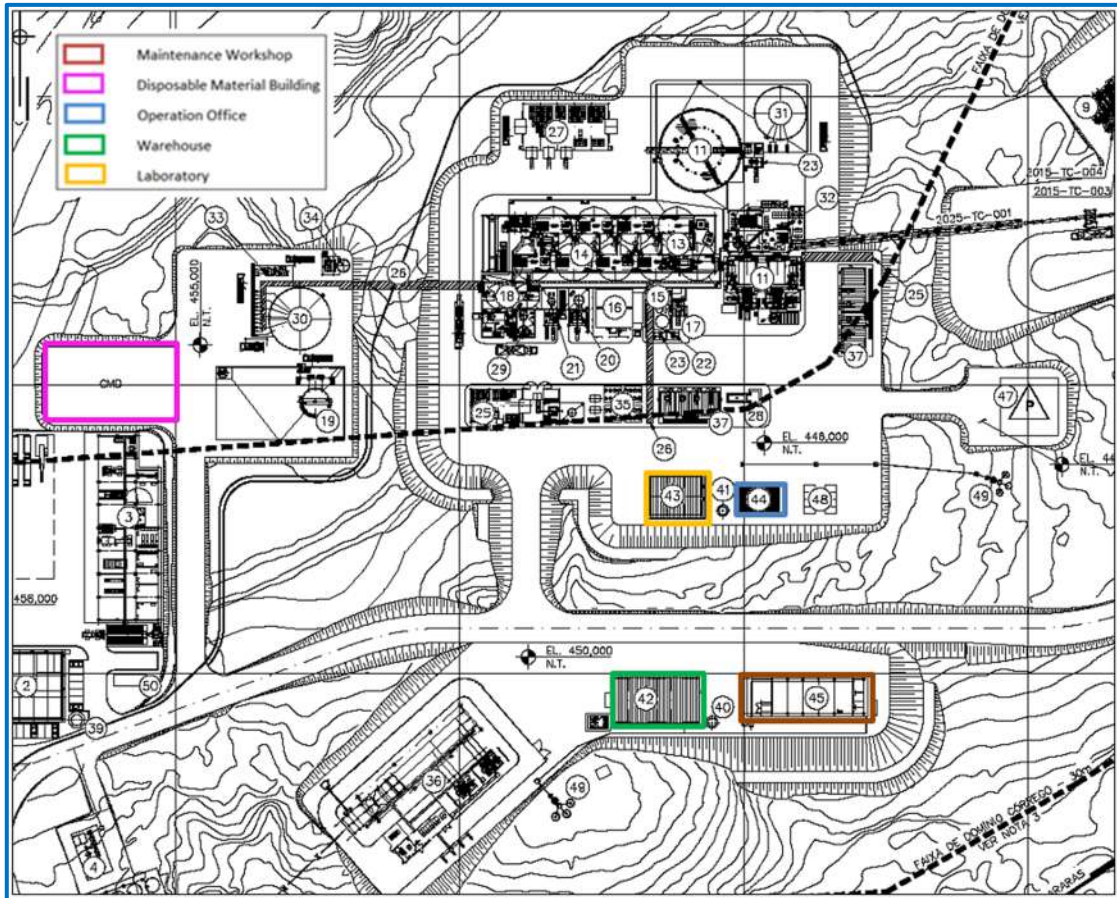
4 shows the industrial area, where the Process Plant and Industrial Support Buildings are located.
